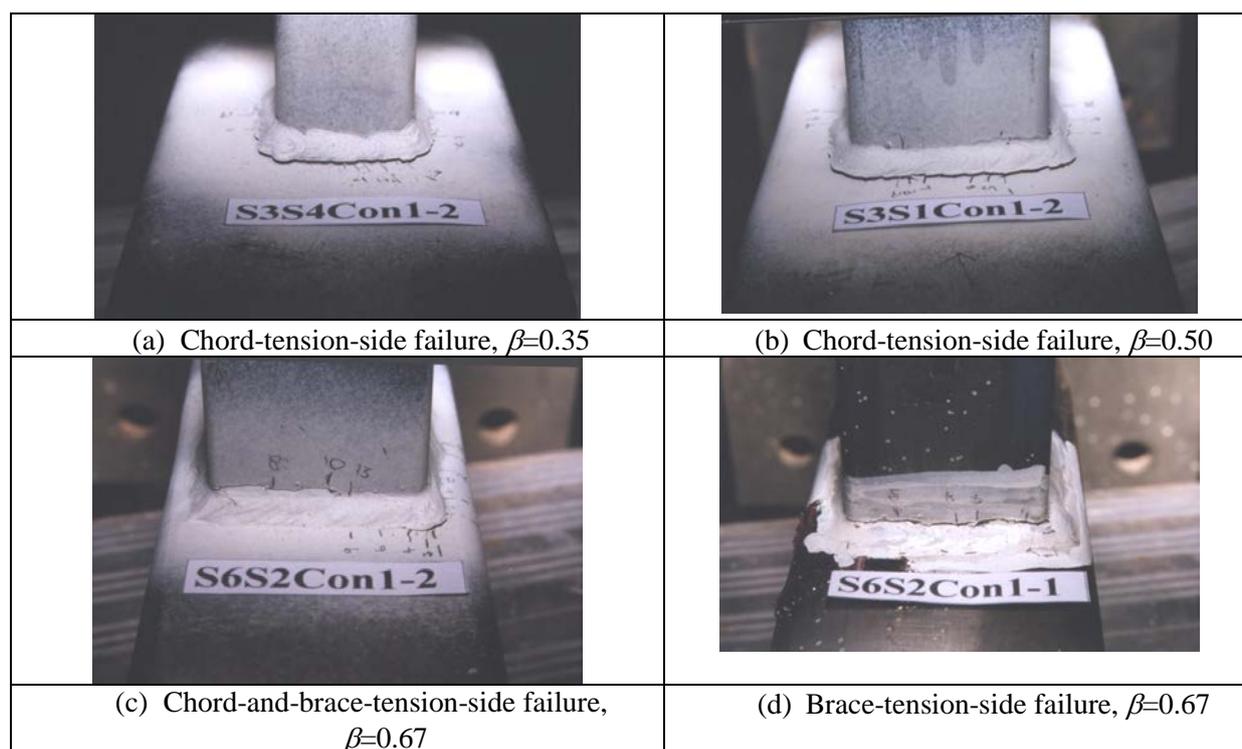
Failure modes in SHS-SHS T-joints with concrete-filled chords
